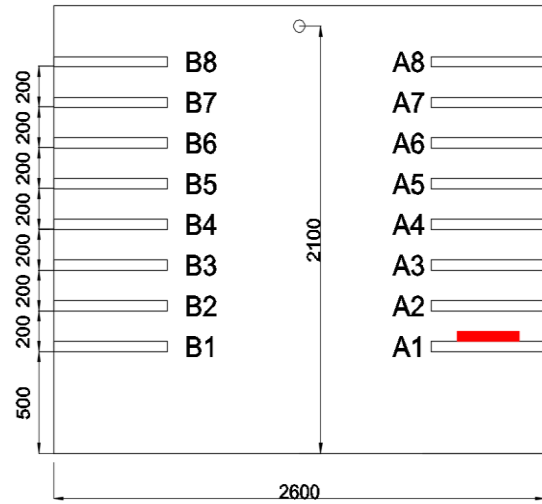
Cross-sectional view of the utility tunnel. (mm)
